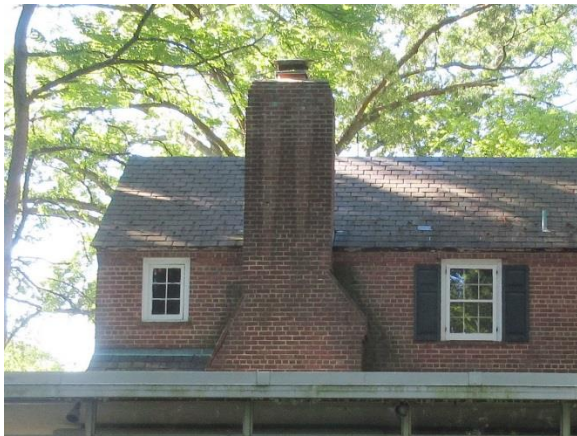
Exterior chimney located on the north eave wall of the east wing.
